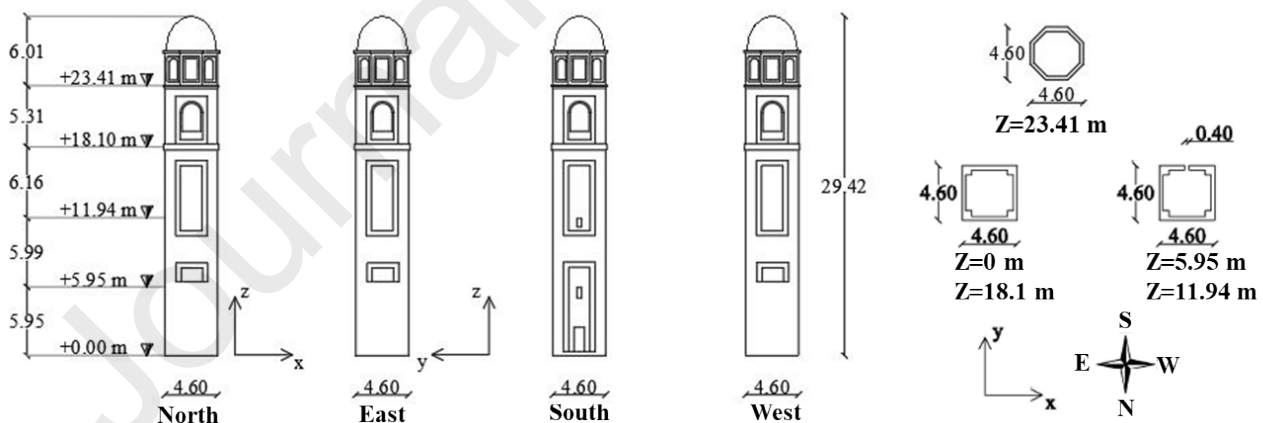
Tower 4. Elevation views, plan and relevant sections of the bell tower with indication of the main geometrical dimensions.
